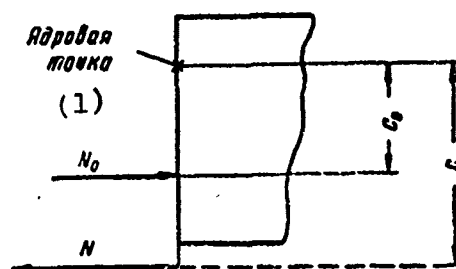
Diagram of the distribution of forces in the transverse section of an eccentrically tensile-stressed prestressed reinforced-concrete element during its rating for crack formation.
